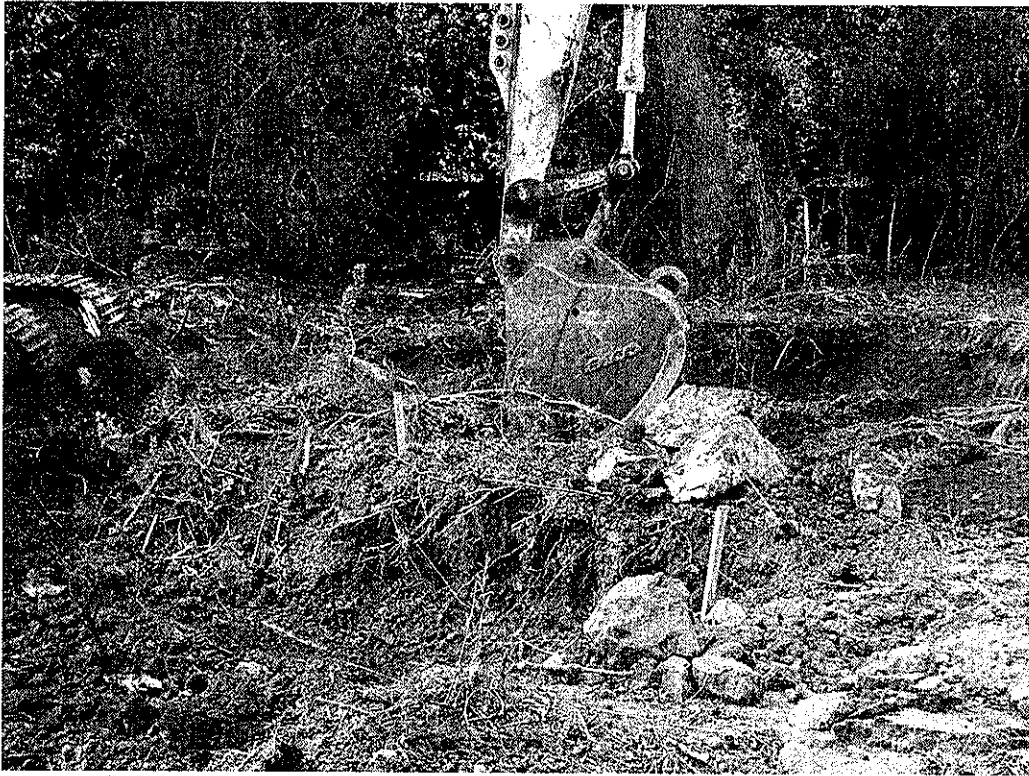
Phase II – Excavation for 48-inch reinforced concrete pipe.
